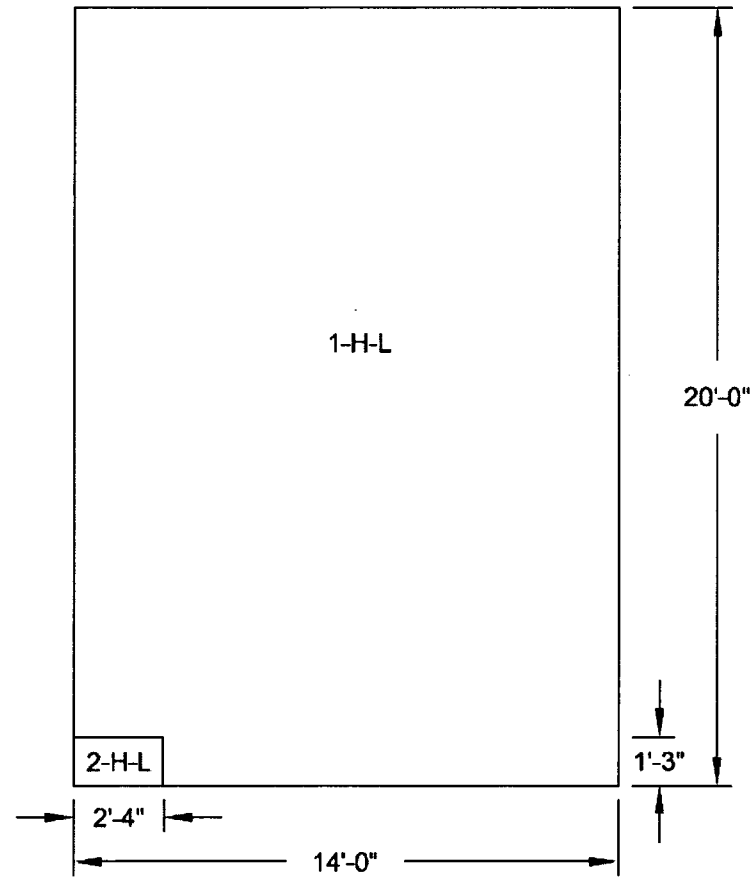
H.6-167 Wall 7 Looking From Outside Transverse Reinforcement Zones
